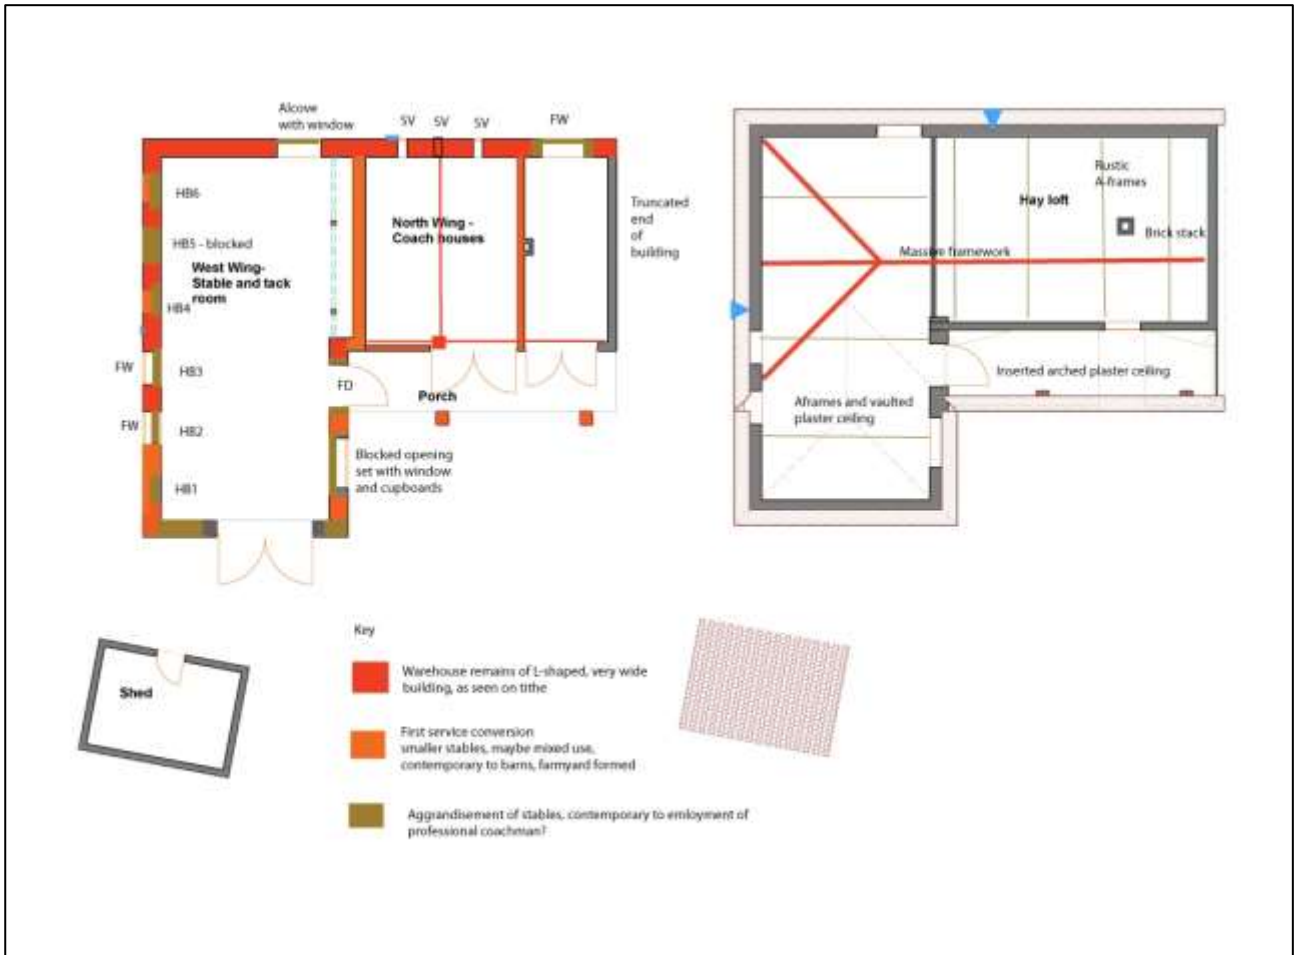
PHASED PLAN (BASED ON AGENTS PLANS).
